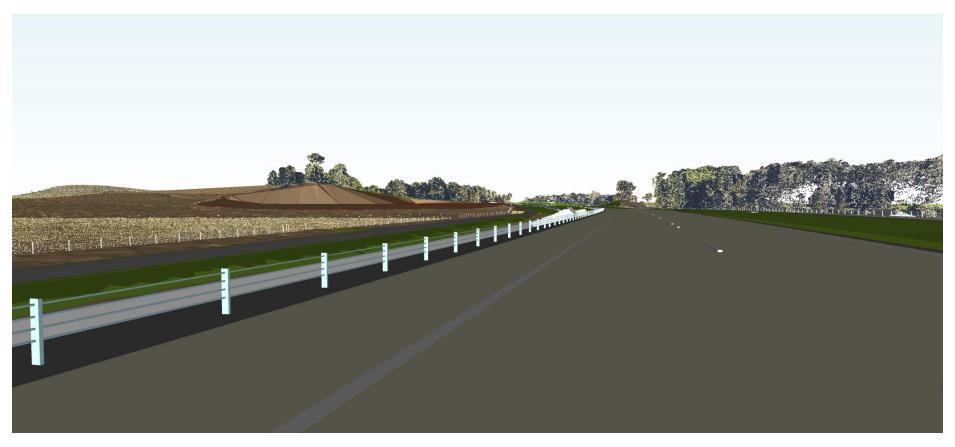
Viewpoint 1 – Looking north along new highway alignment post excavation
